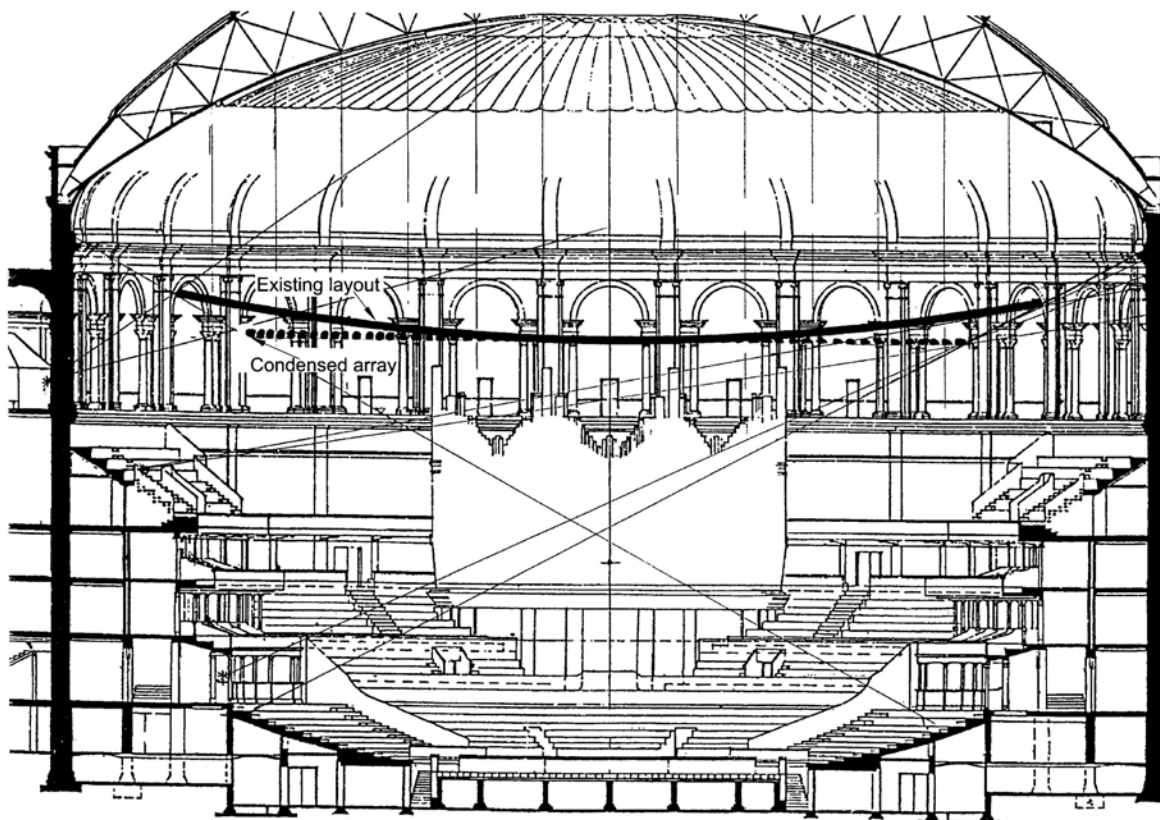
, Section of the existing and the new, condensed mushroom array (section)
